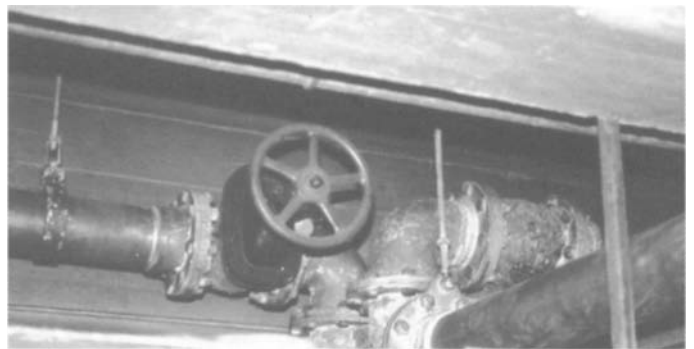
Excessive residue on pipe fittings and hanger—copper pipe is clean.
